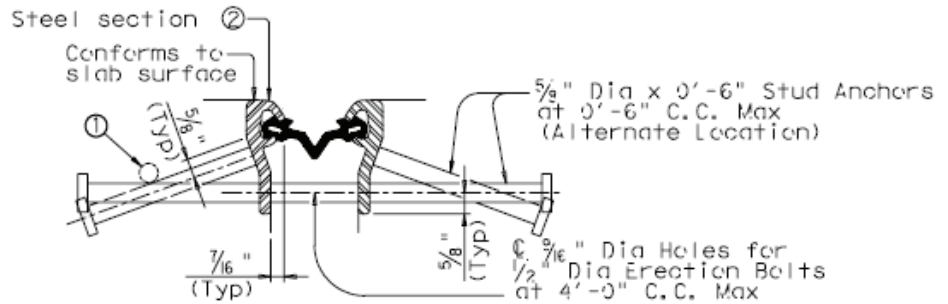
Strip Seal (Drawing Courtesy of the D.S. Brown Co.)
